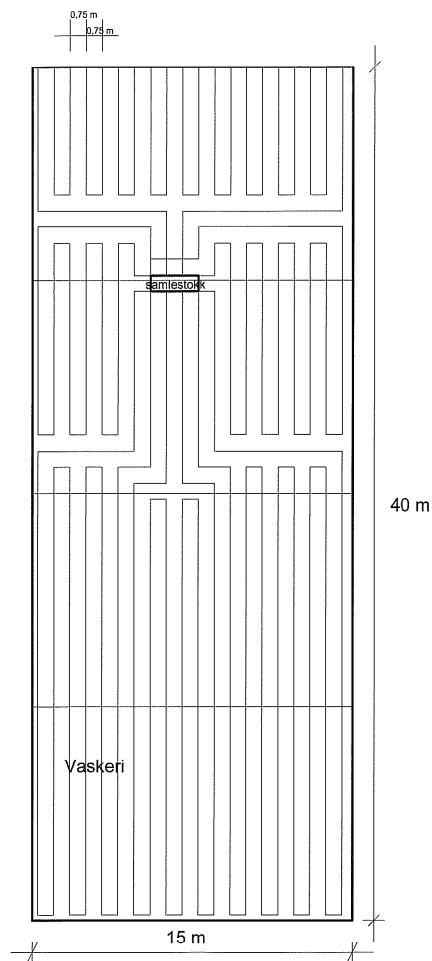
Layout of the cooling pipes at the ISS-buildings.
